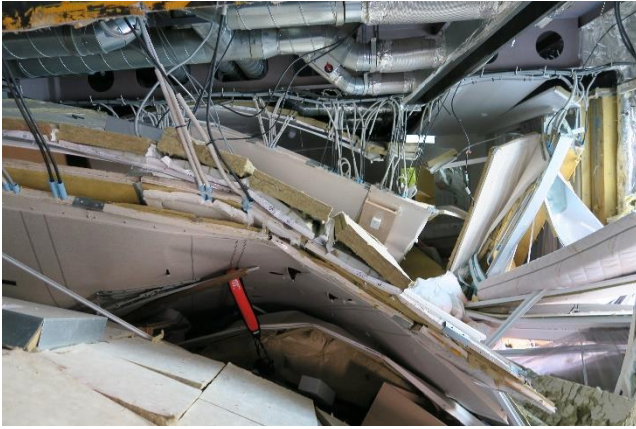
Photo from stateroom area showing damage to partition walls, floor and furnishings. Photo: NSIA
